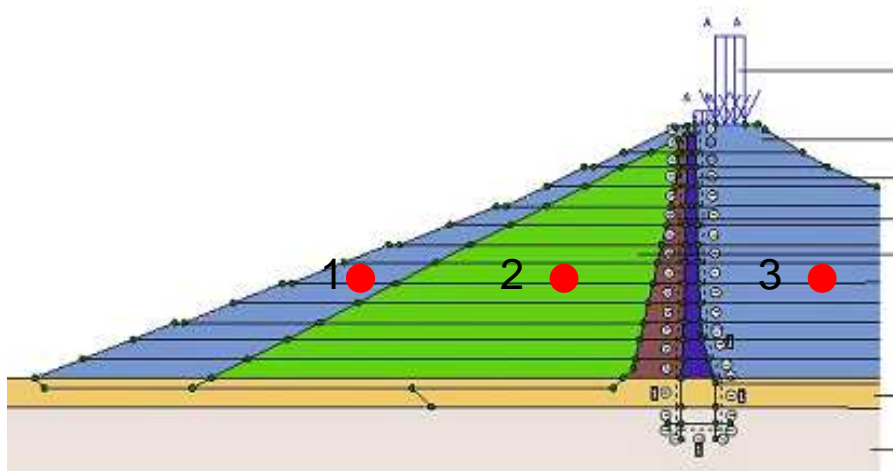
possible damage zones, definition and subdivision into rock fill (water side) (1), sealing body (2) and rock fill (downstream) (3)
